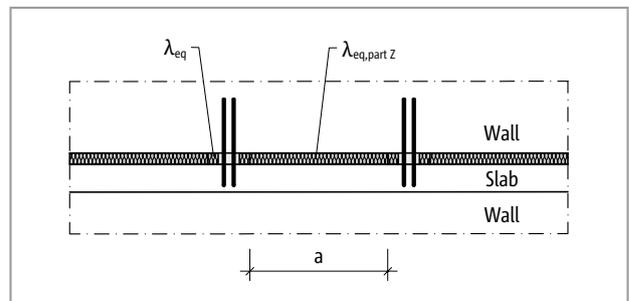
Representation of two sectional axes for the determination of $\lambda_{eq,mean}$ of a wall connection detail with point-sited Schöck Sconnex® type W and insulation in between
